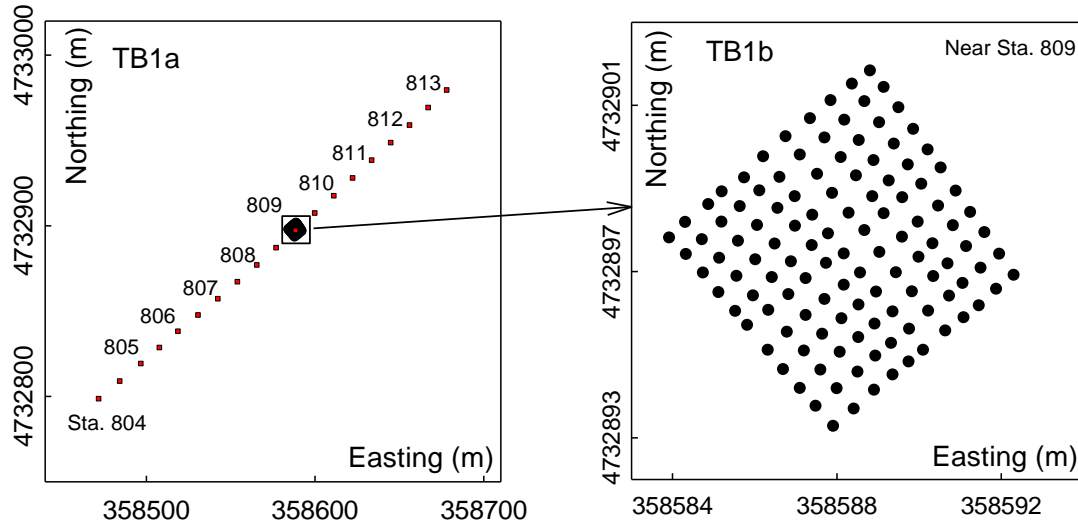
MI I-94 TS1: Plan view of in situ test locations
